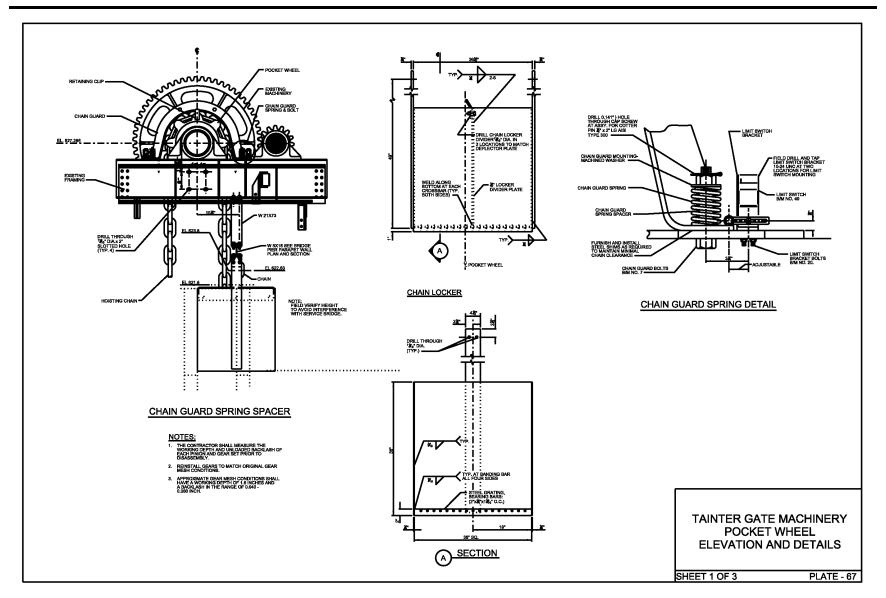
Plate 67: Tainter gate machinery, pocket wheel, elevation, and details (sheet 1 of 3)
